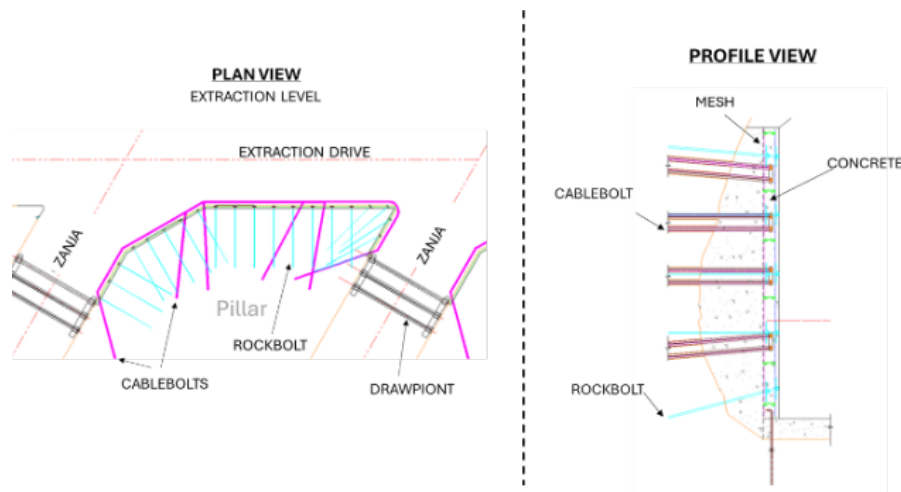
Plan and profile views of general reinforcement – confinement wall for production pillars
